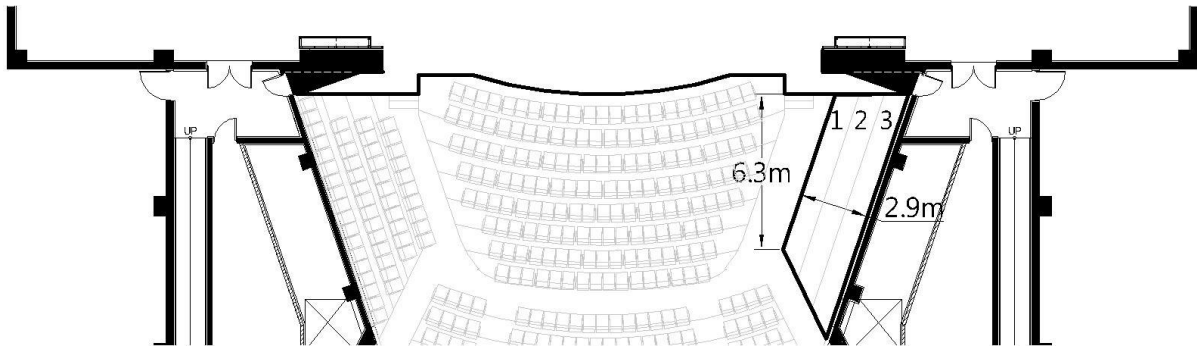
Chinese Orchestra Pit (Side Auditorium Platform) location plan
